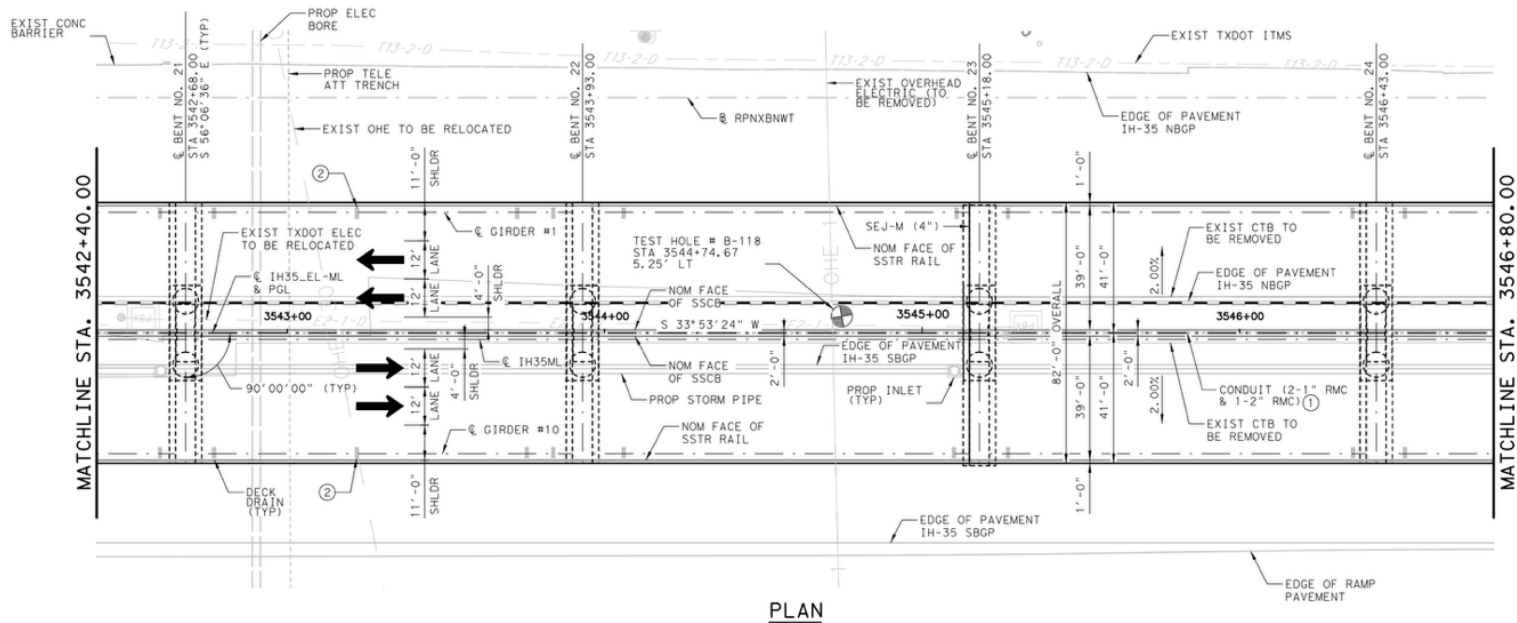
Bridge Layout Example from Highway Project Plans (TxDOT, 2022d)
